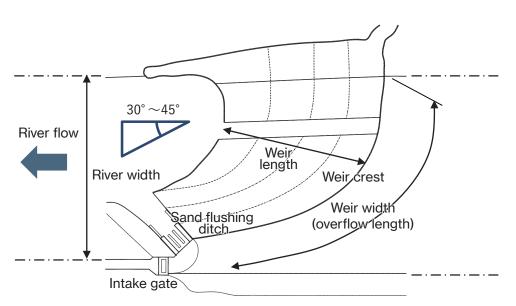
Plane Design Model of the Boulder Oblique Weir²)
